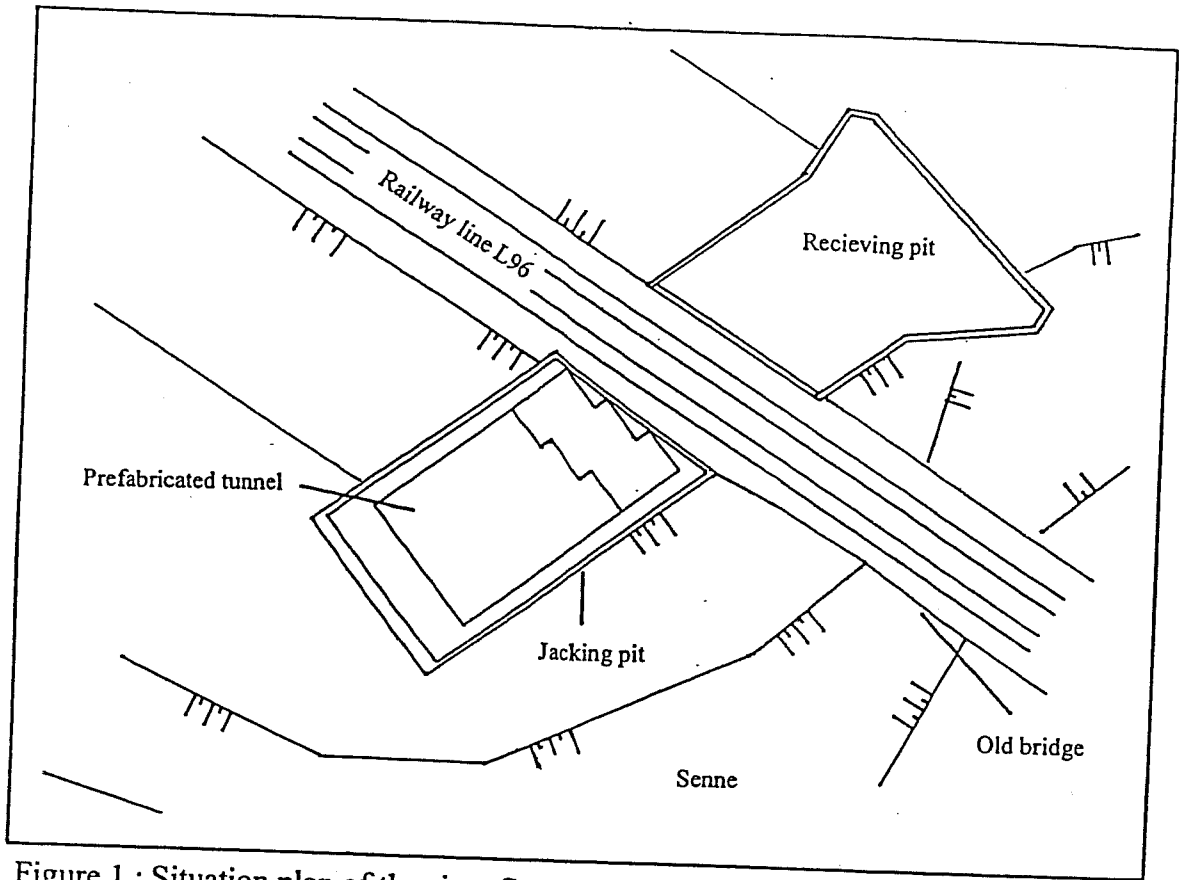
Situation plan of the river Senne, construction pit, railway and old bridge.
